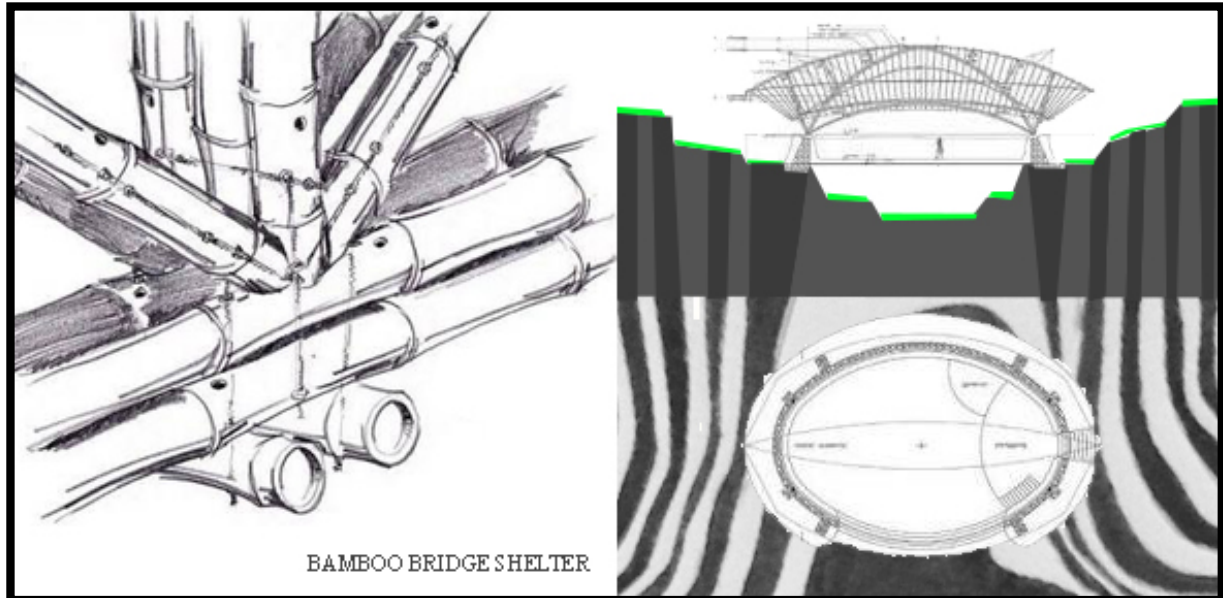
Bamboo bridge shelter. Xinhua 2016.
